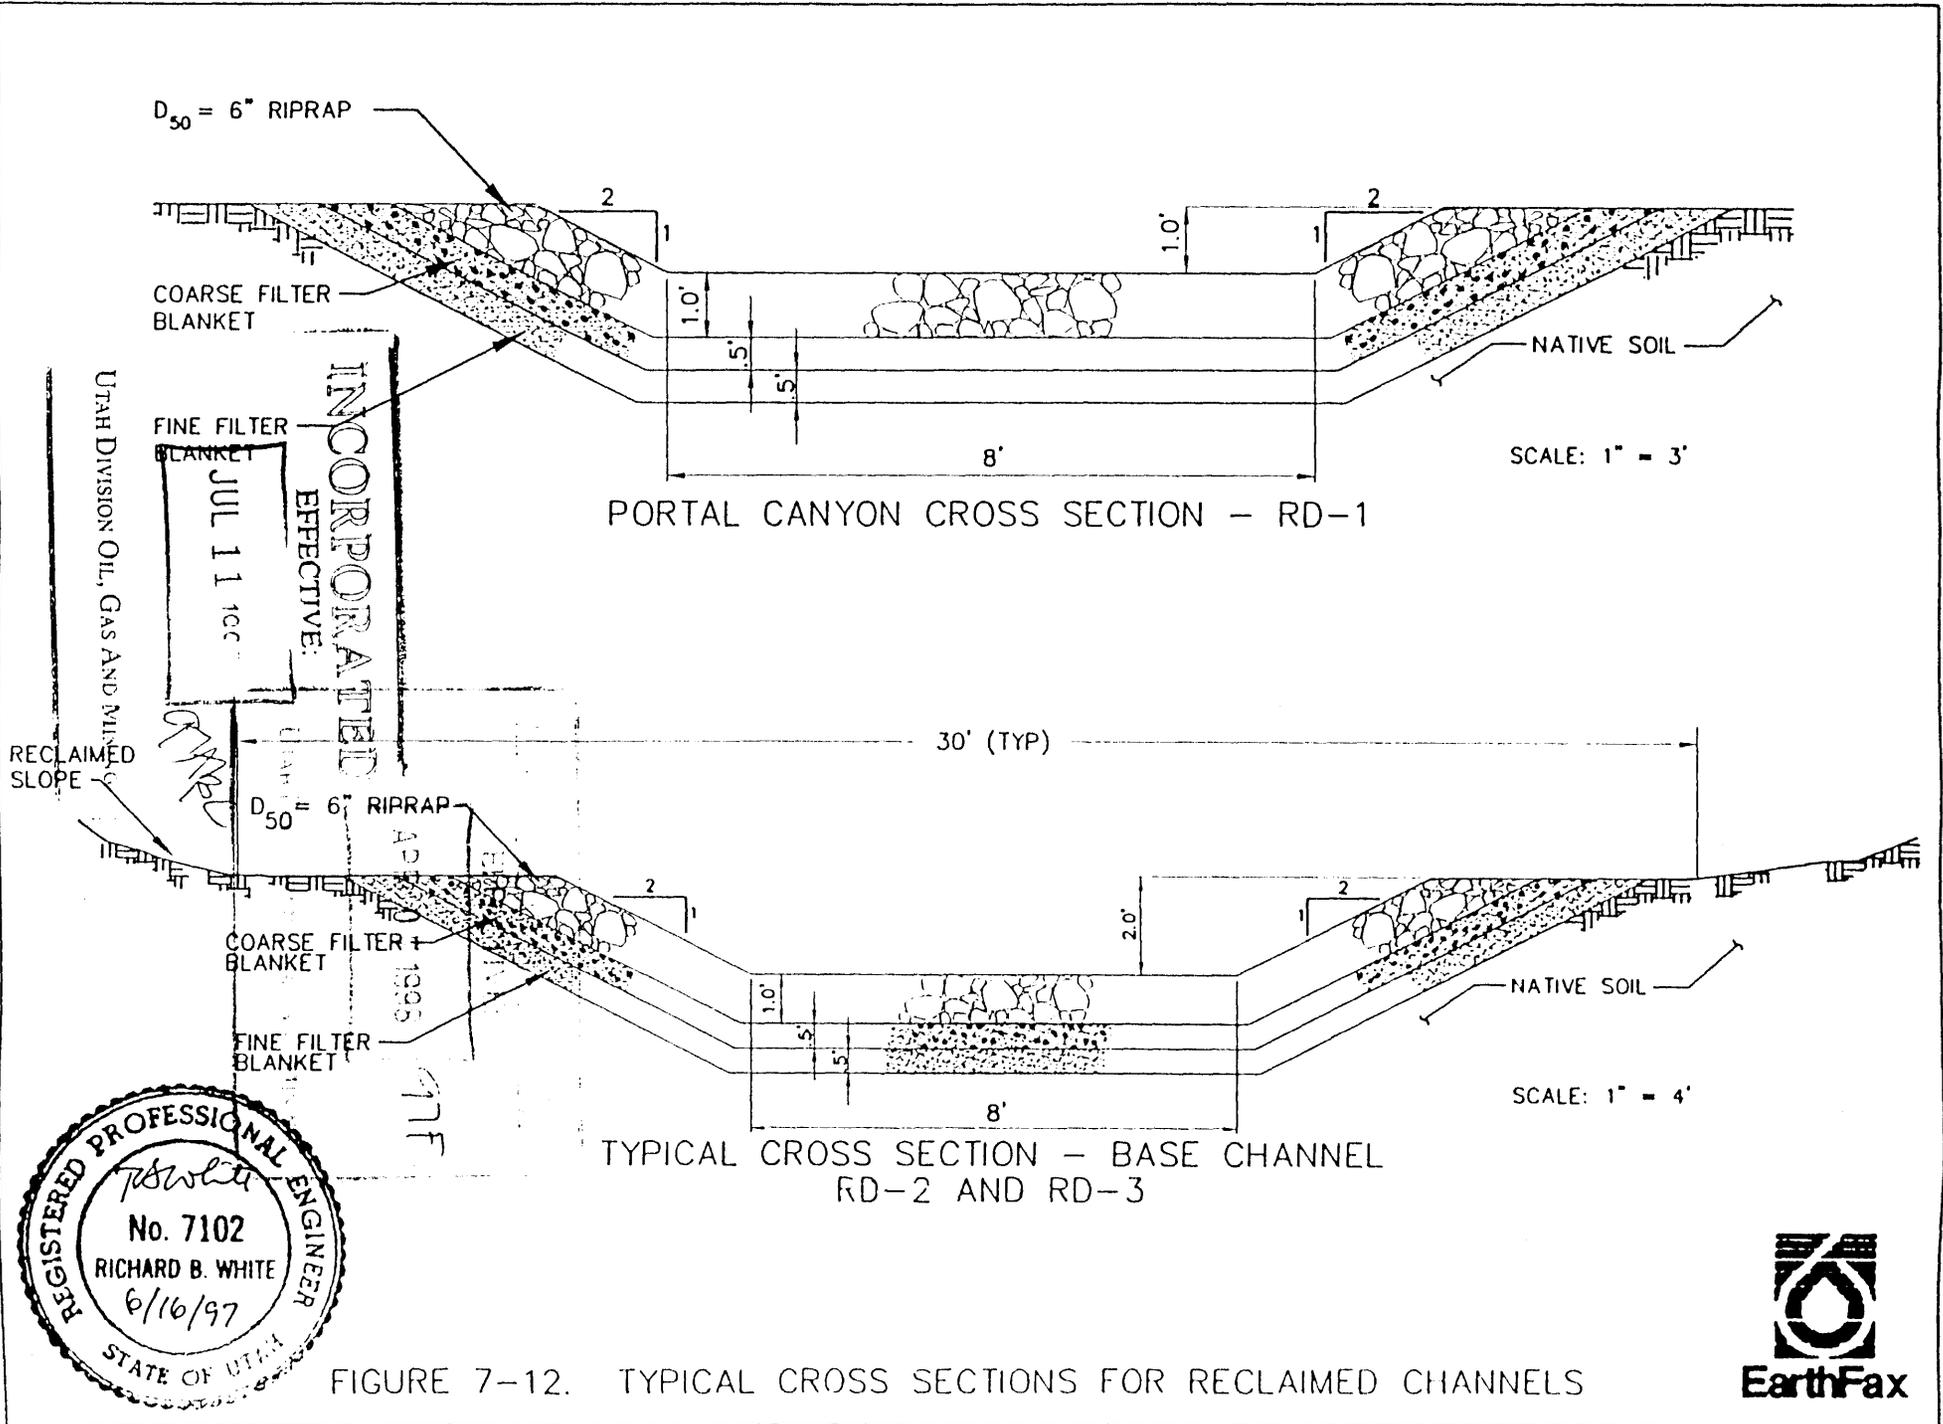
TYPICAL CROSS SECTIONS FOR RECLAIMED CHANNELS
